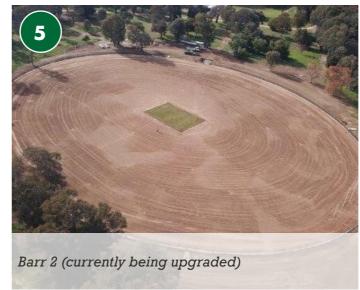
Some of the unique place based elements the Masterplan Plan will build on
